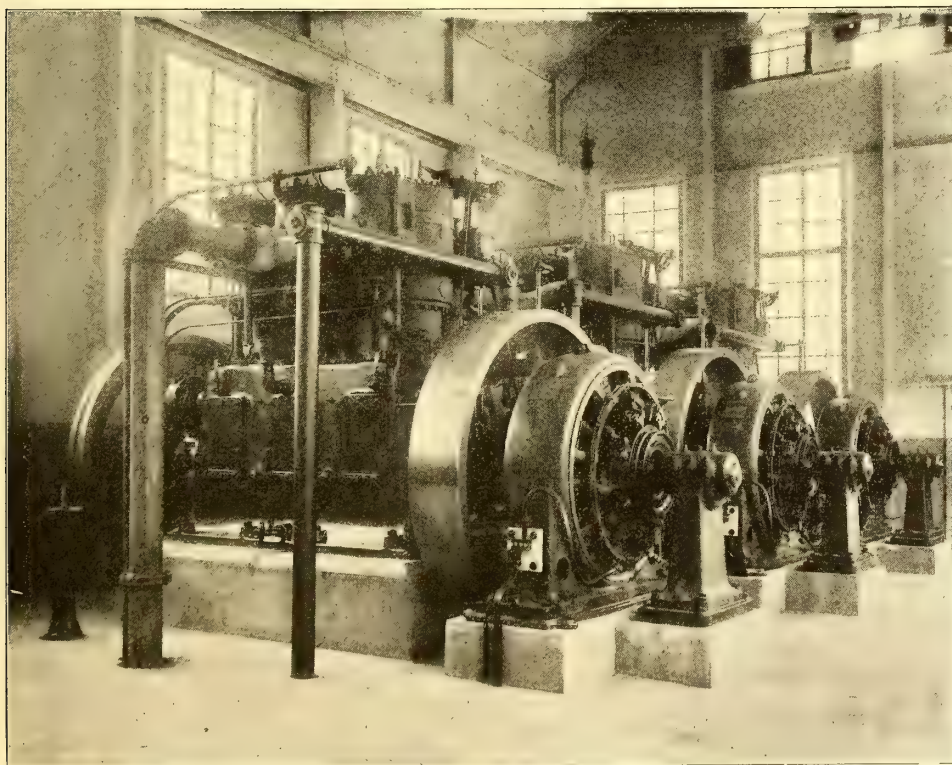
SECTION OF 1900-HP INDUSTRIAL GAS PLANT OF THE WINCHESTER REPEATING ARMS COMPANY, SHOWING SOLE-PLATE PIER CONSTRUCTION
